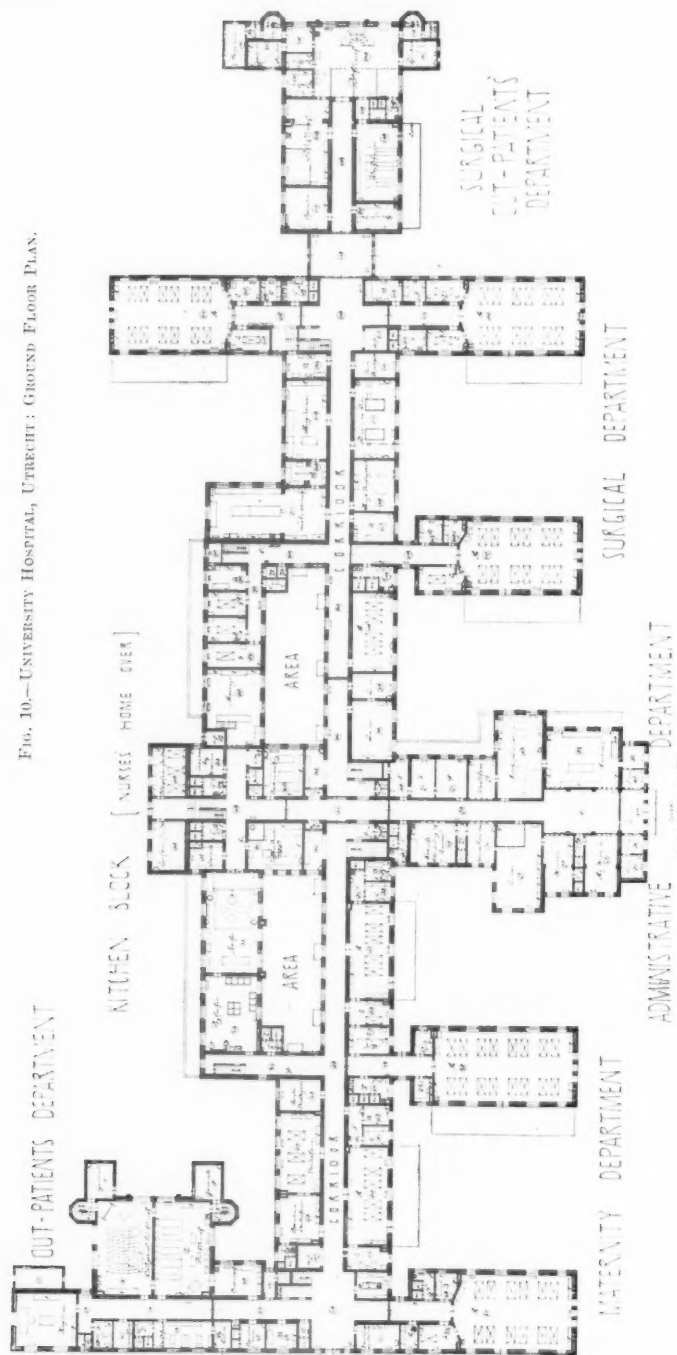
UNIVERSITY HOSPITAL, UTRECHT: GROUND FLOOR PLAN.
